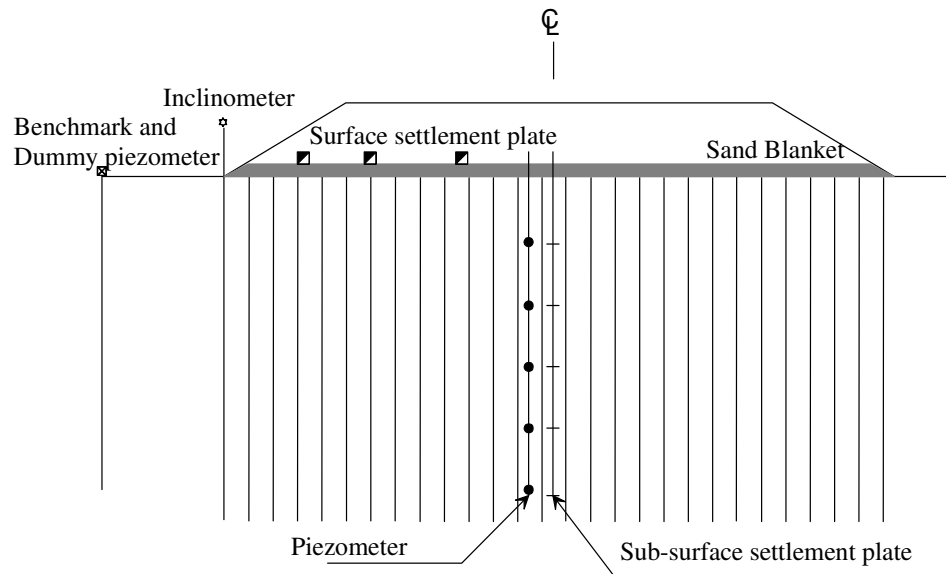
Typical vertical cross section of vertical drain system (Indraratna et al. 2005b)
